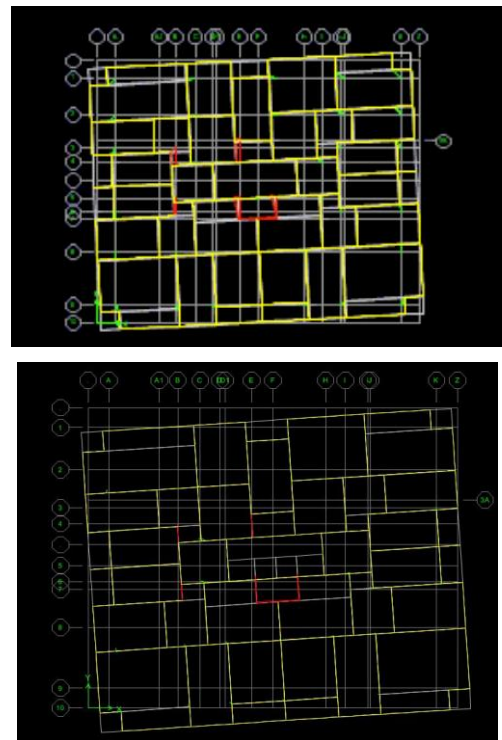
Rotational/torsional collapse of Zumrut Building in plan view.
